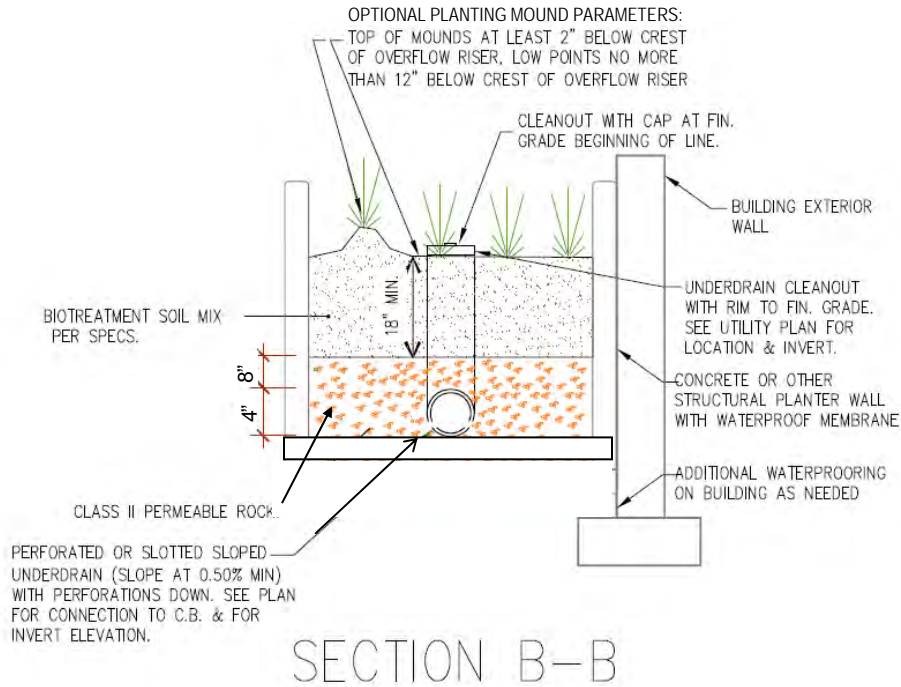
Cross section B-B of flow-through planter, shows cross section of underdrain
